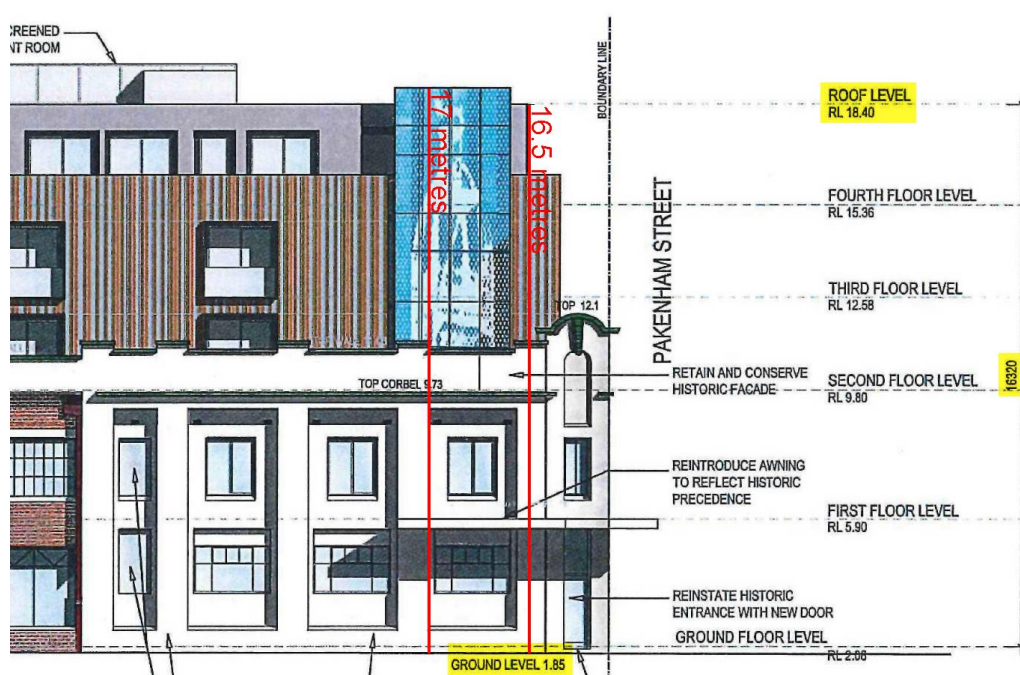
North (Short Street) elevation of the 'Quest' building south east of the subject site. Note: Building height maximum 17.2m to top of AC plant room, 17m to top of glass façade, 16.5m wall height.
